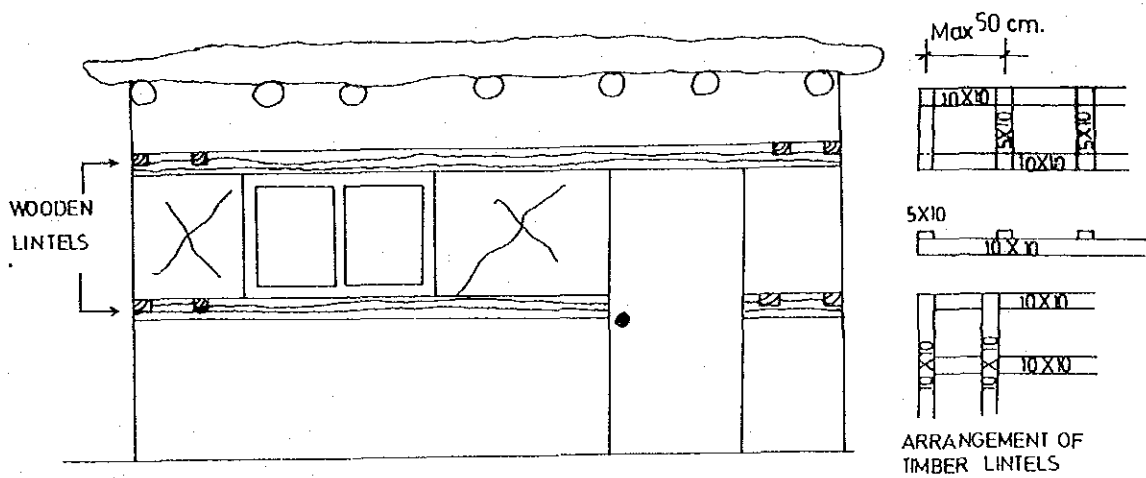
Wooden Lintels To prevent the Extension of Cracks.
